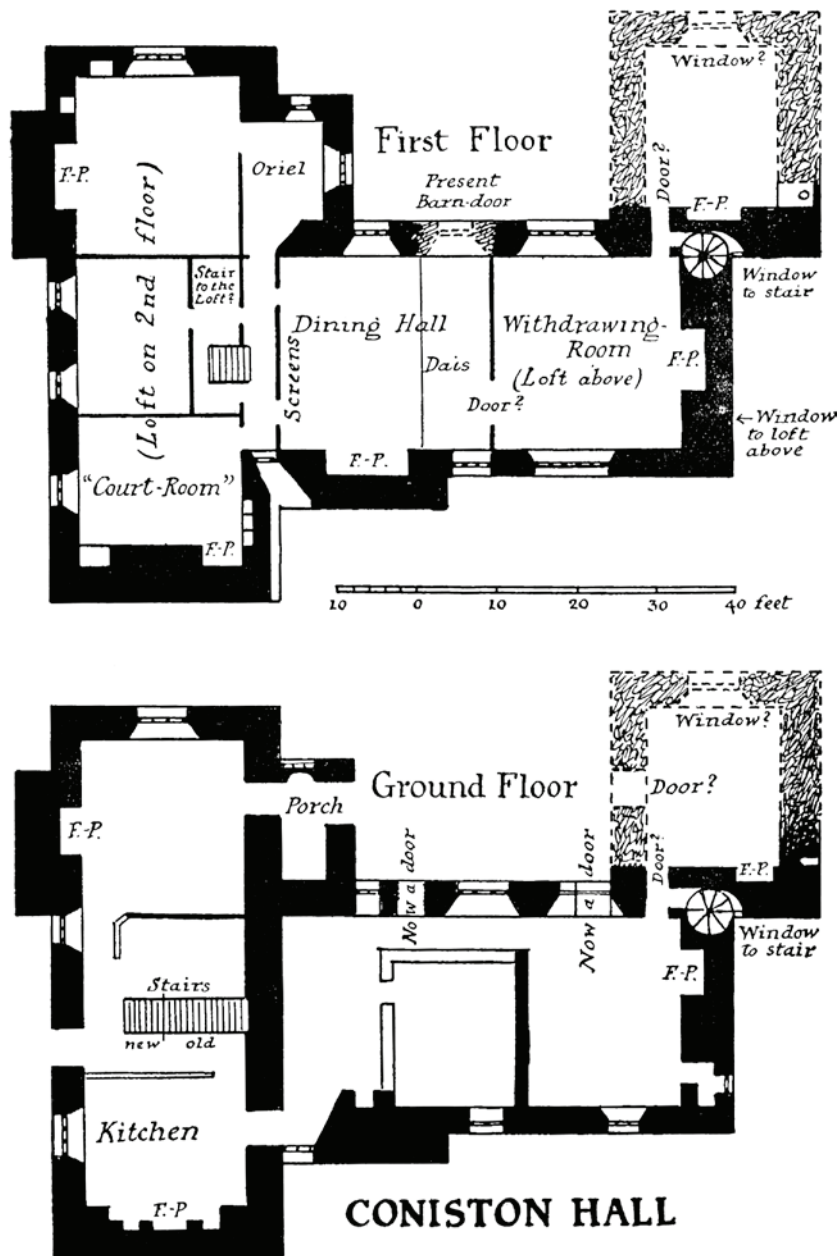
Ground and first floor plans of Coniston Hall (after Collingwood 1910, 357)
